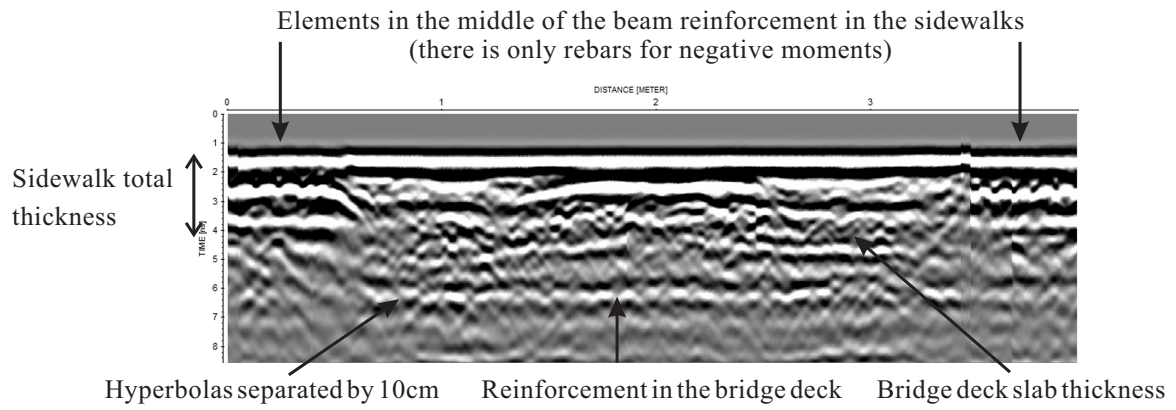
Results in the bridge deck: transversal test, from sidewalk to sidewalk
